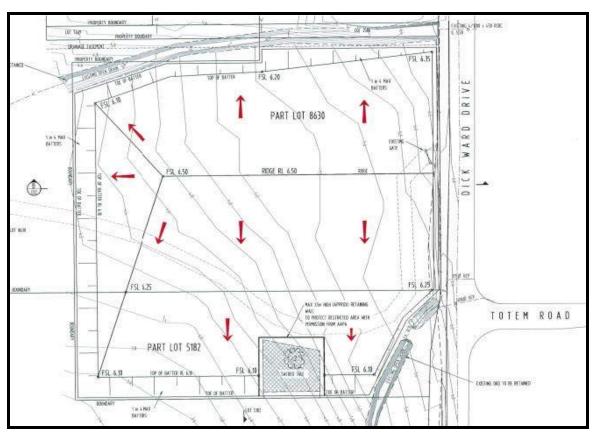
Proposed development area Dick Ward Drive – Totem Road Intersection
